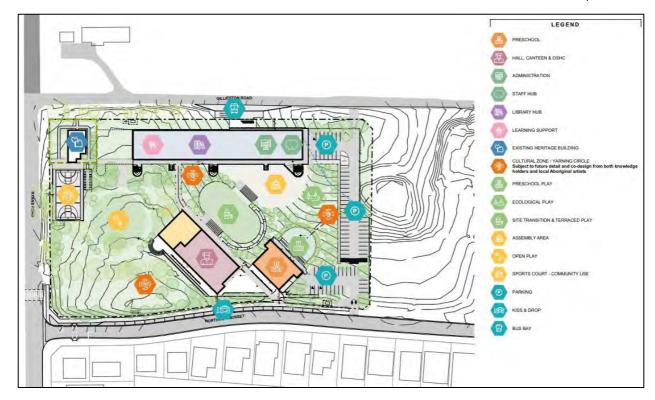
Proposed Site Plan and Building Placement (SHAC:2024)
